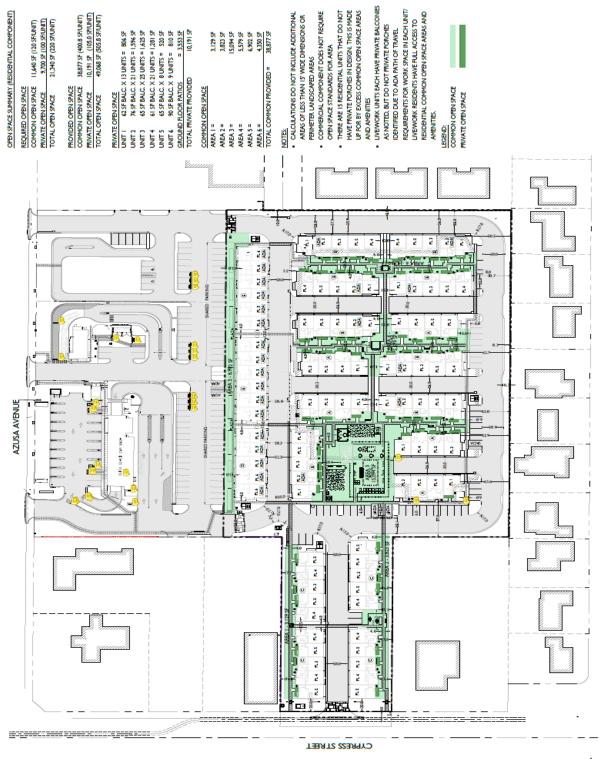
Schematic Landscape, Wall & Fence, Lighting, Planting, and Trash & Hauler Circulation Plans
